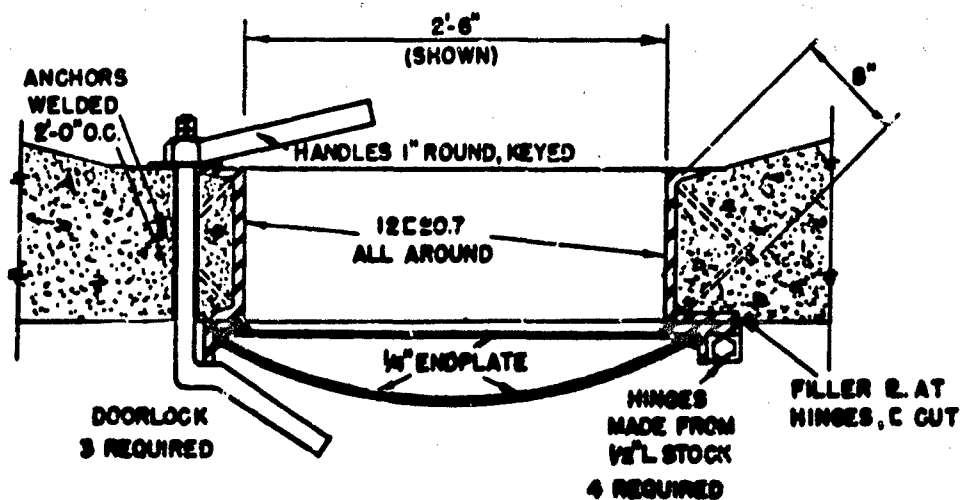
Walk-through door in a horizontal passage; alternate frame and attachments details.
